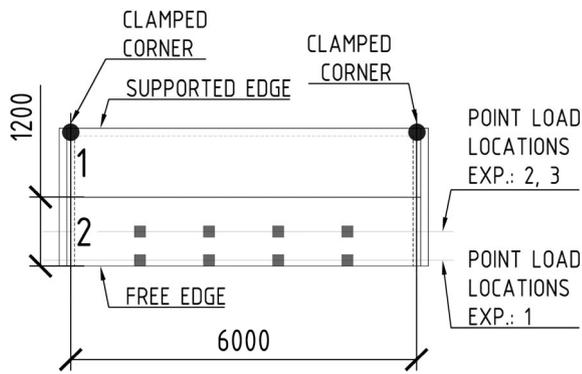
Test setup adopted by Walraven.<sup>48</sup>
